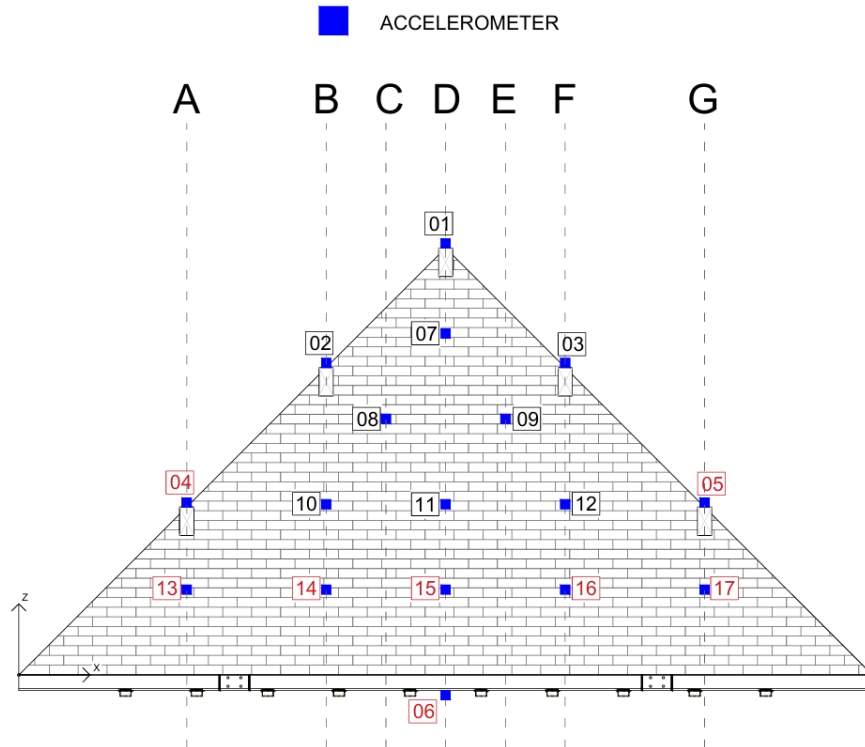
Schematic overview of the accelerometers placed on the gable wall specimen
